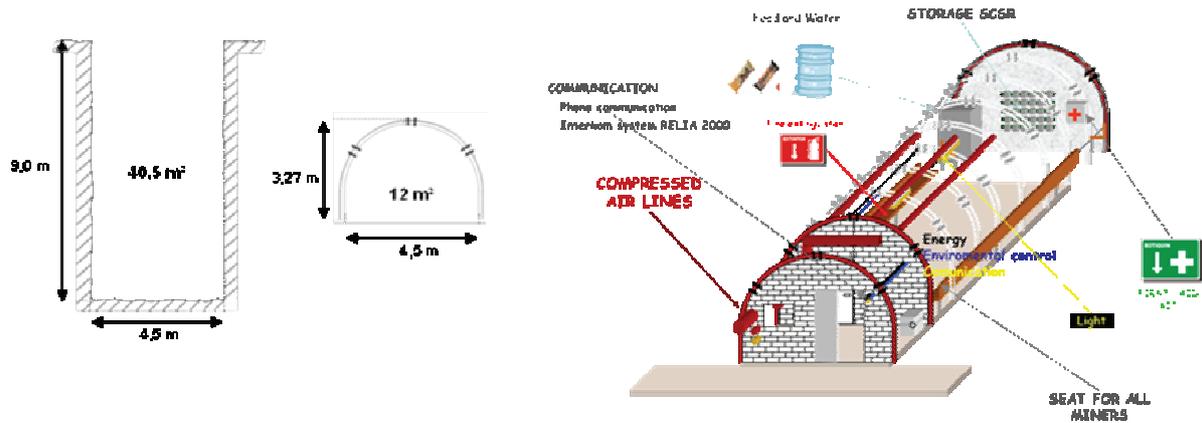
Refuge excavation dimensions and final prototype refuge design
